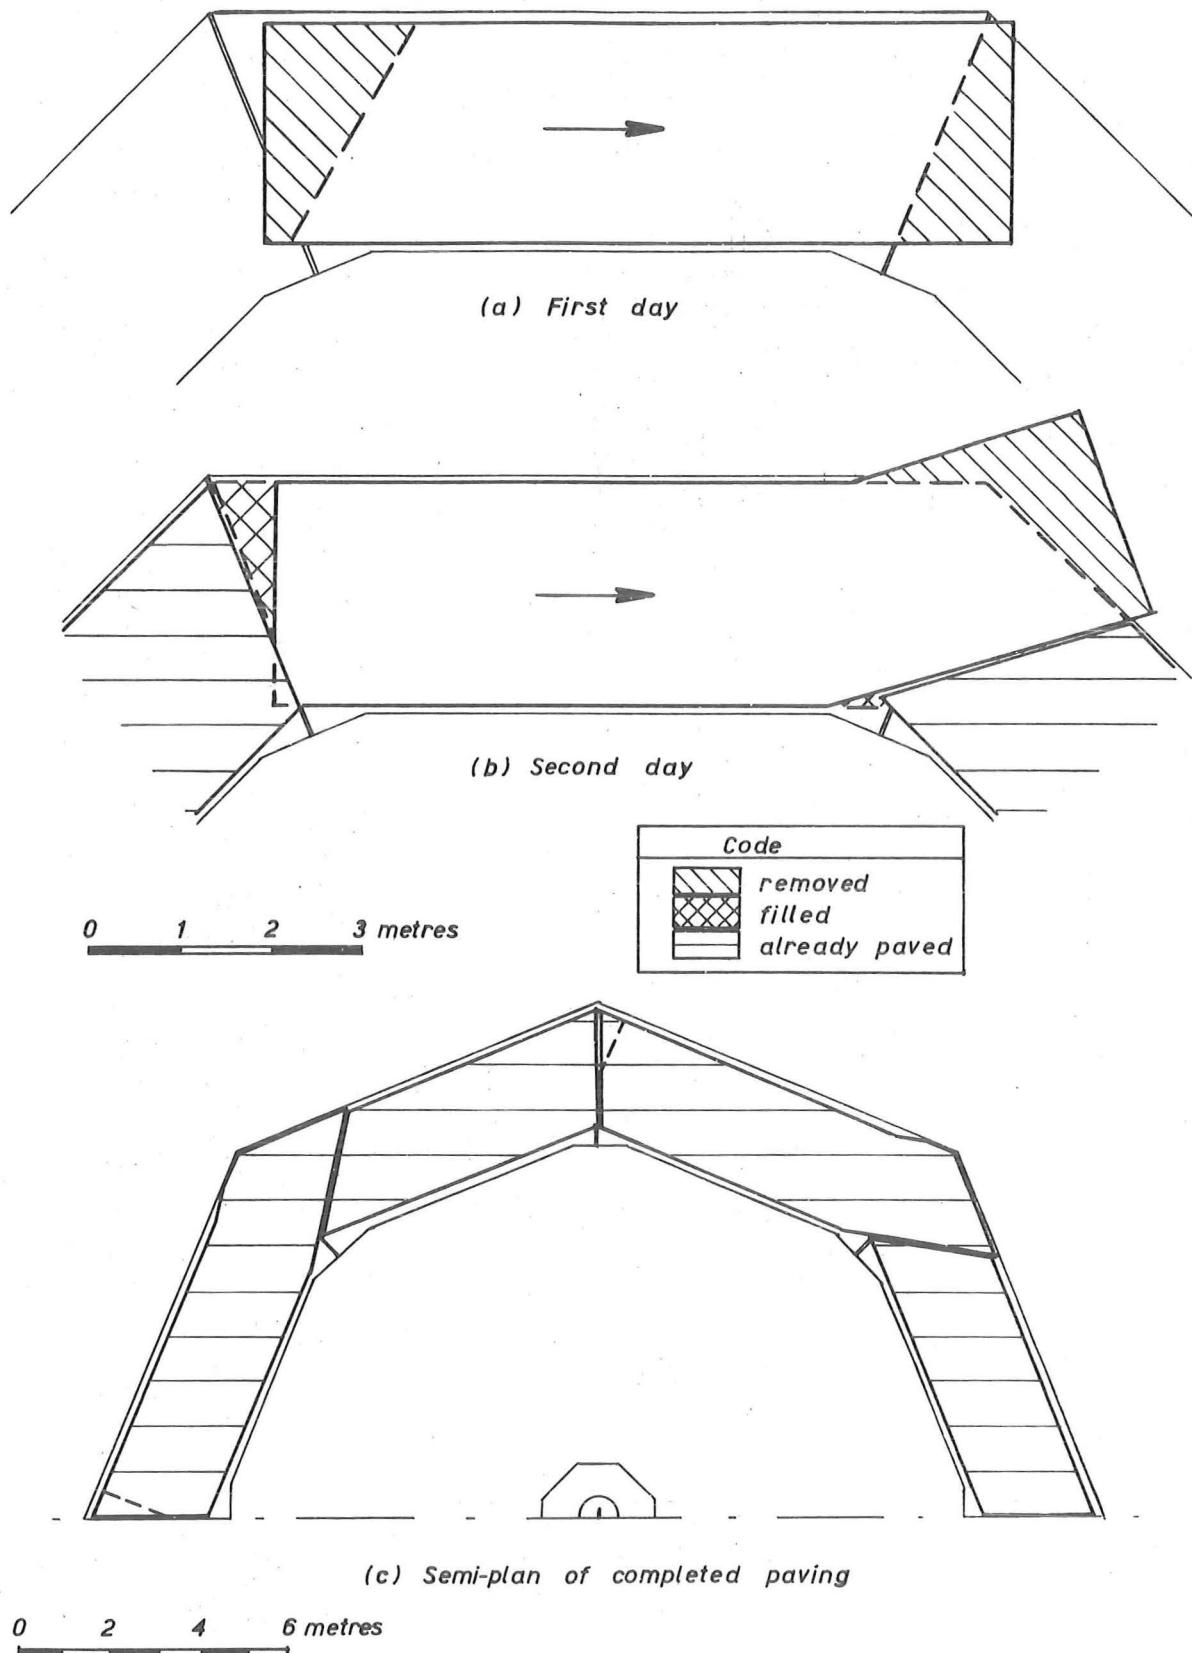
PAVING LAYOUT AT THE TESTING TRACK
